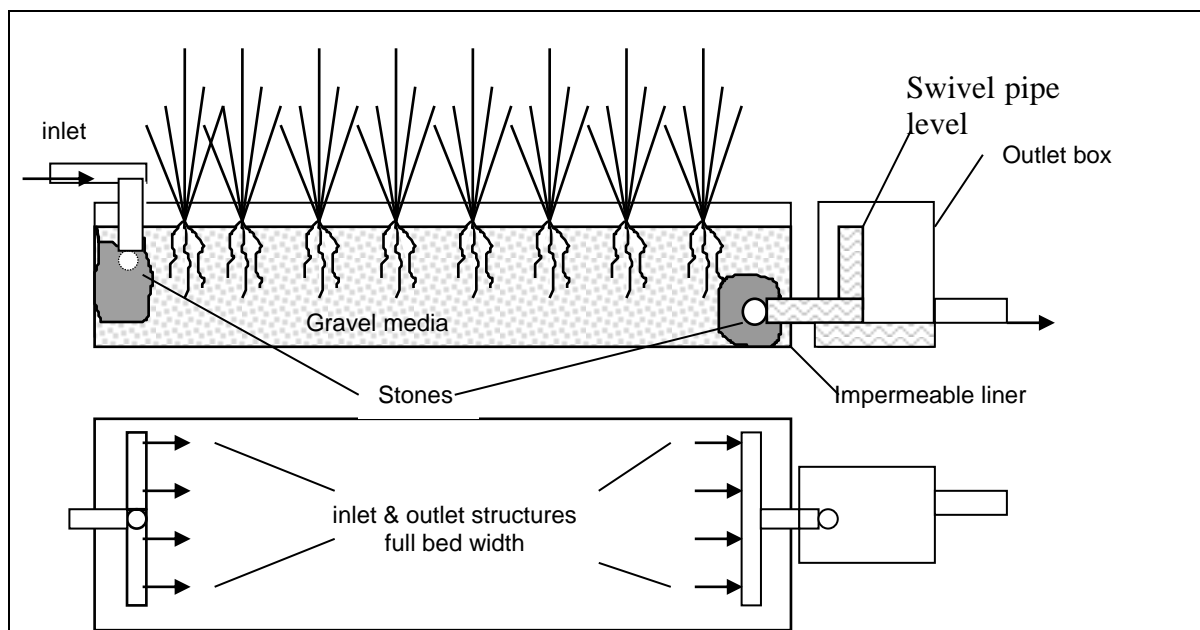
Elevation and Plan Views of Typical Horizontal Subsurface Flow Wetland
